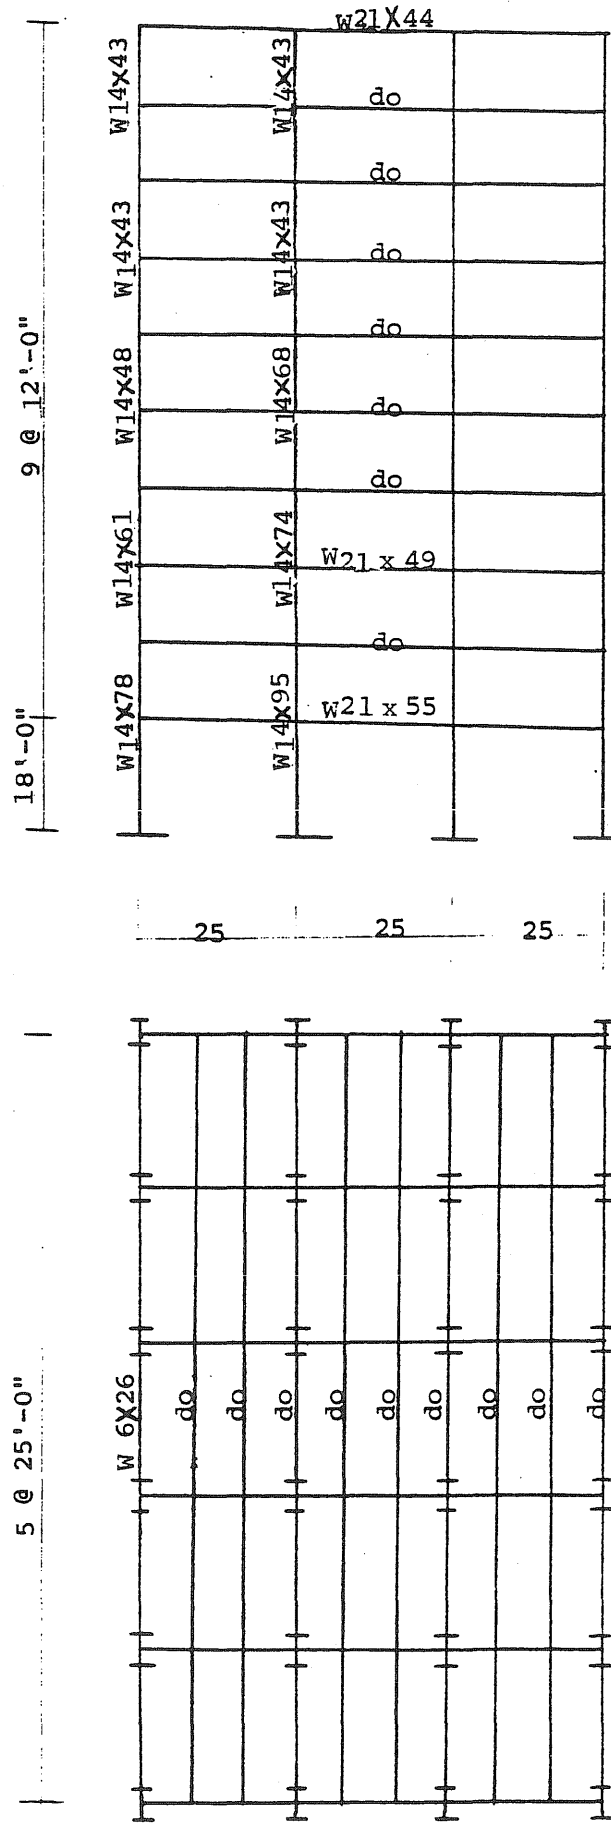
Plan and Elevation of Ten-Story Steel Building Frame
